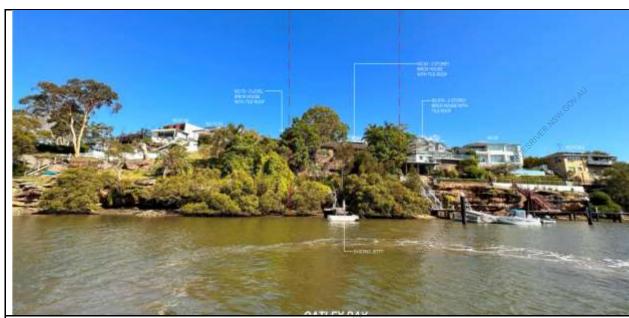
Existing Views from the Water (Source: MGA Architects)
